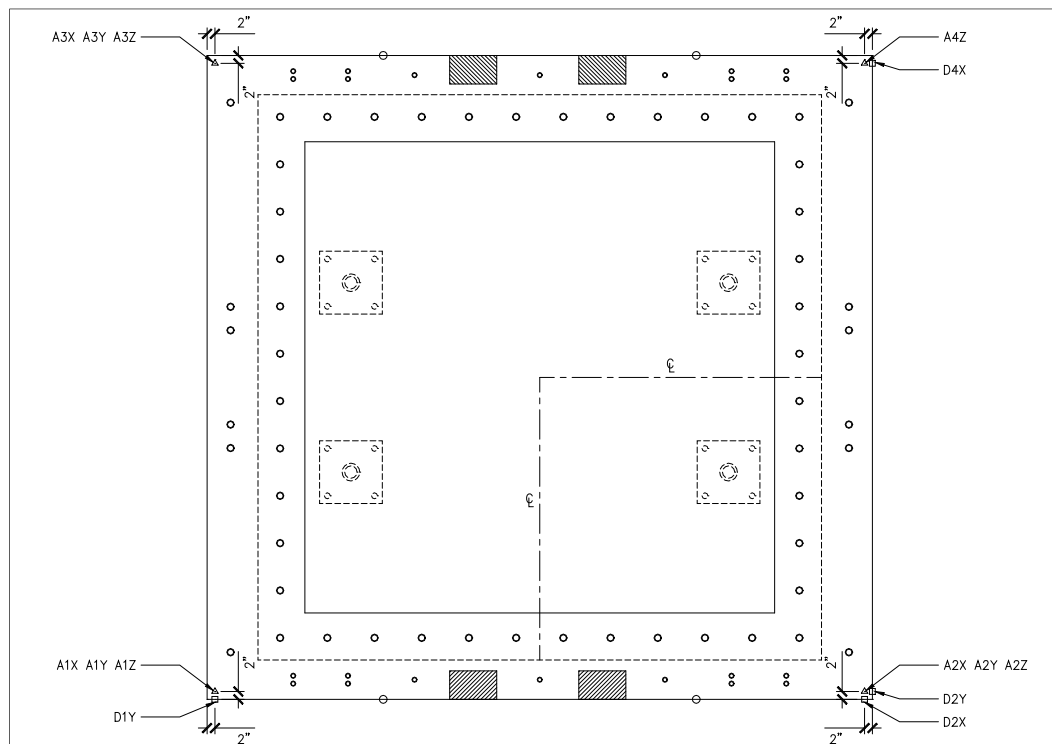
Plan view of the first-story slab showing instrumentation.
